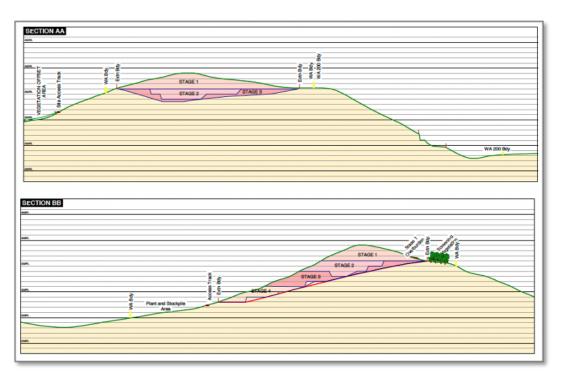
Excerpt of Site Layout Plan, shown sections AA and BB.
